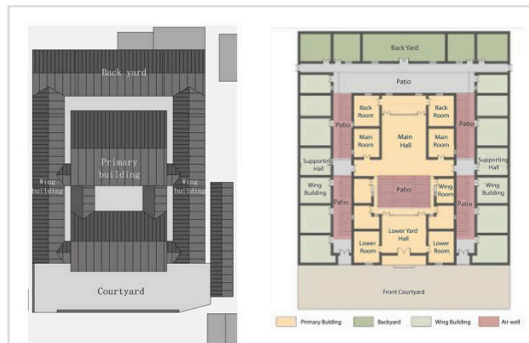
left picture is the general layout, right is floor plan with 5 patio or courtyard
